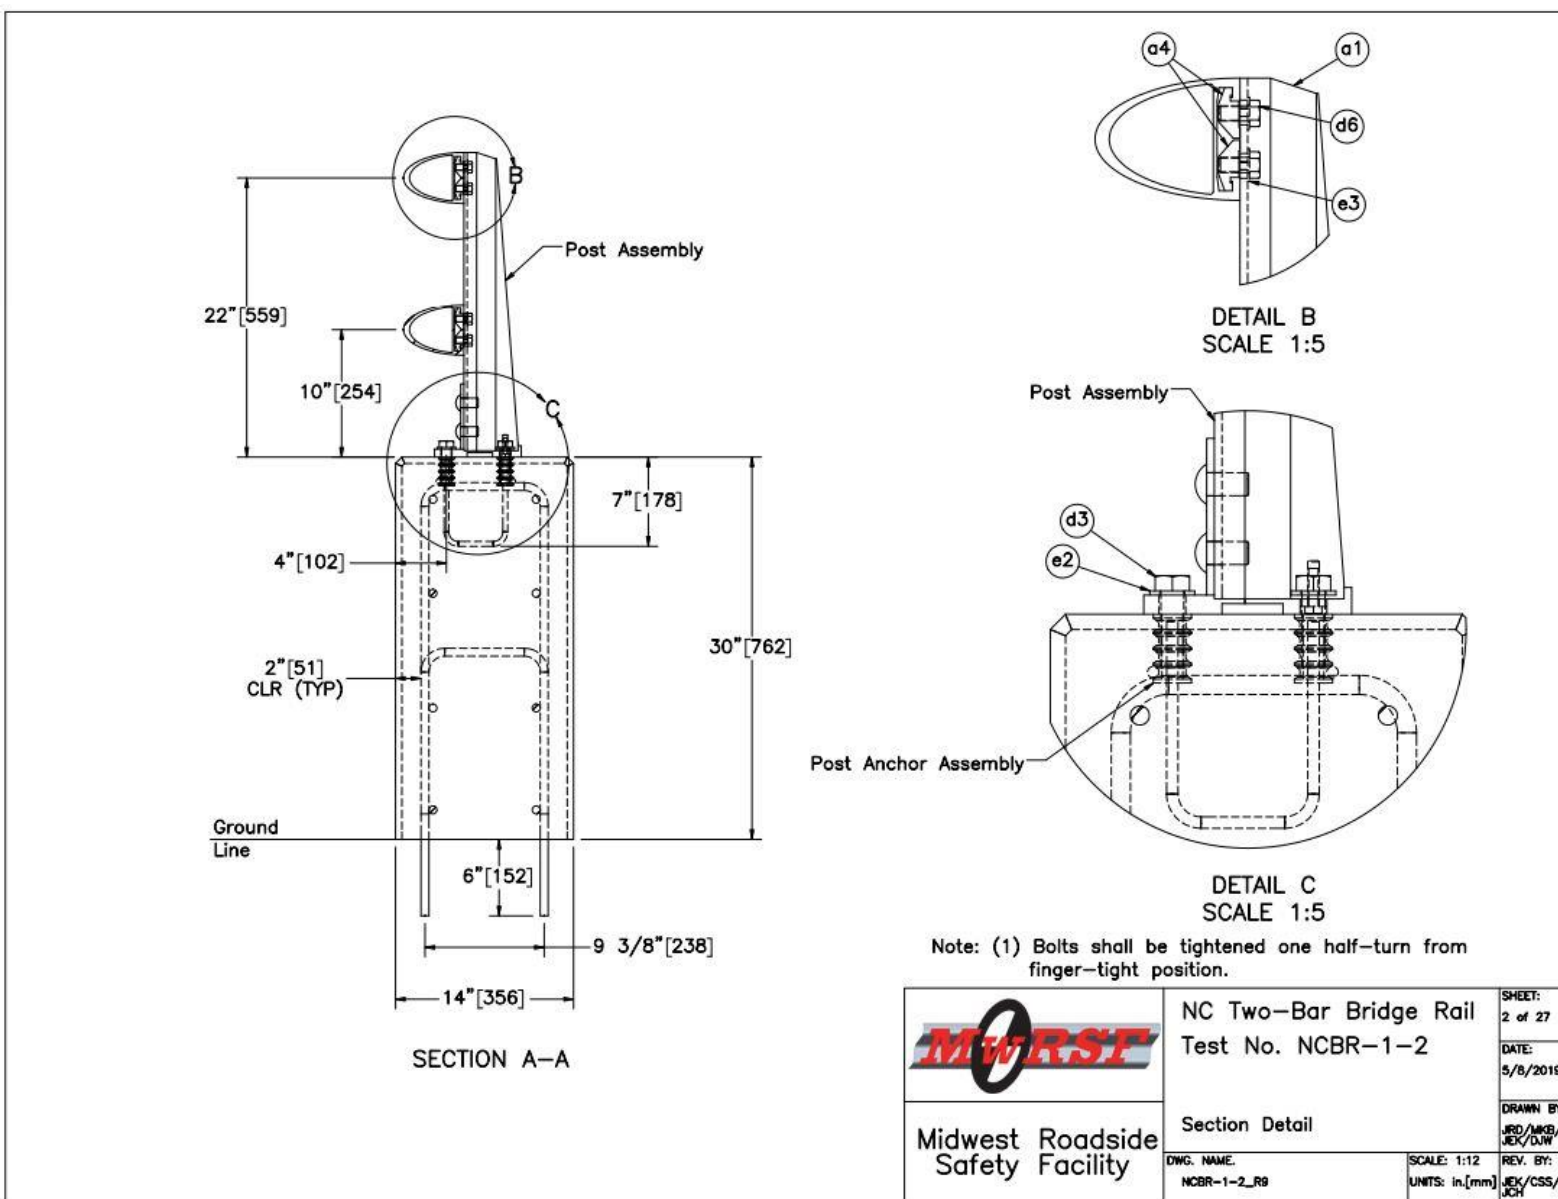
Section Detail, Test Nos. NCBR-1 and NCBR-2
